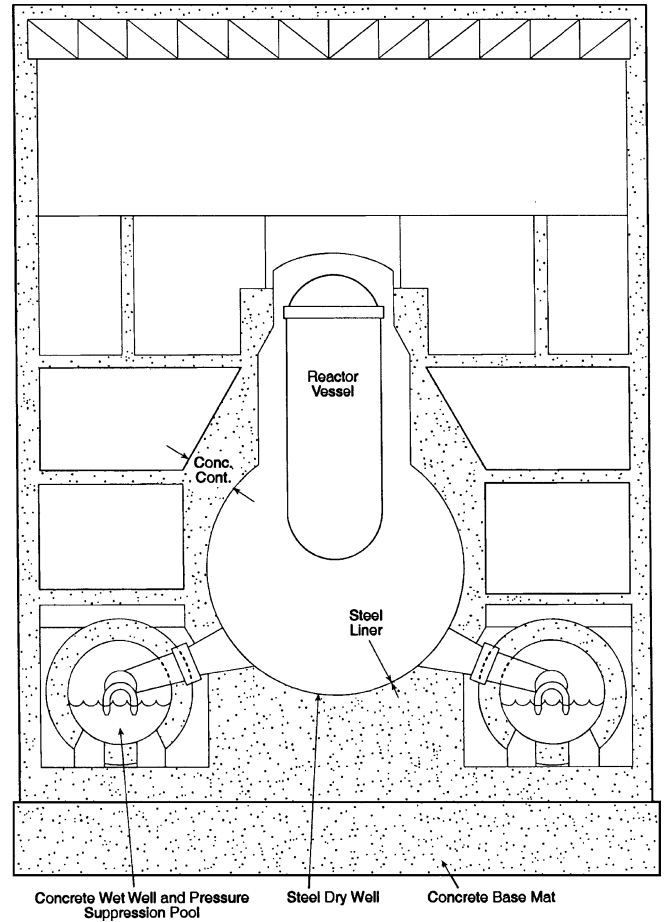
BWR MARK I CONCRETE WET-WALL CONTAINMENT
